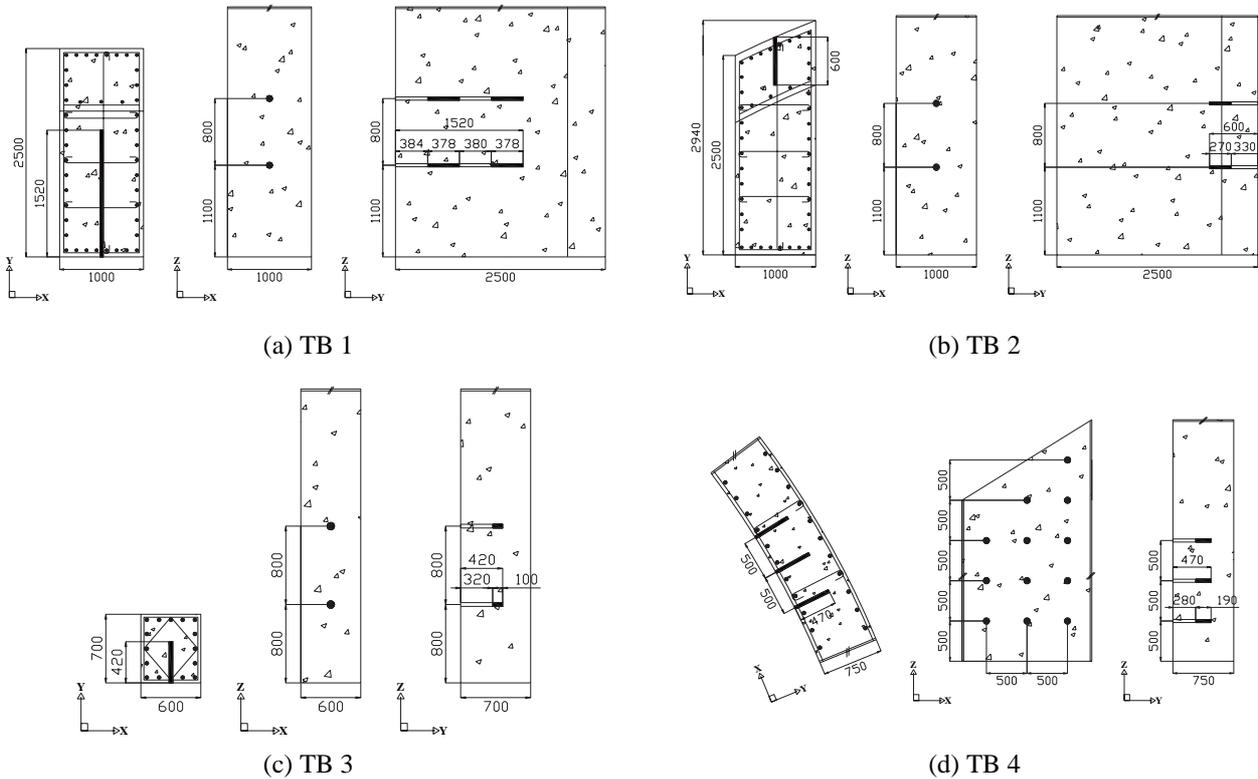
Pattern diagram of drilling and loading for test blasting (unit : mm).
